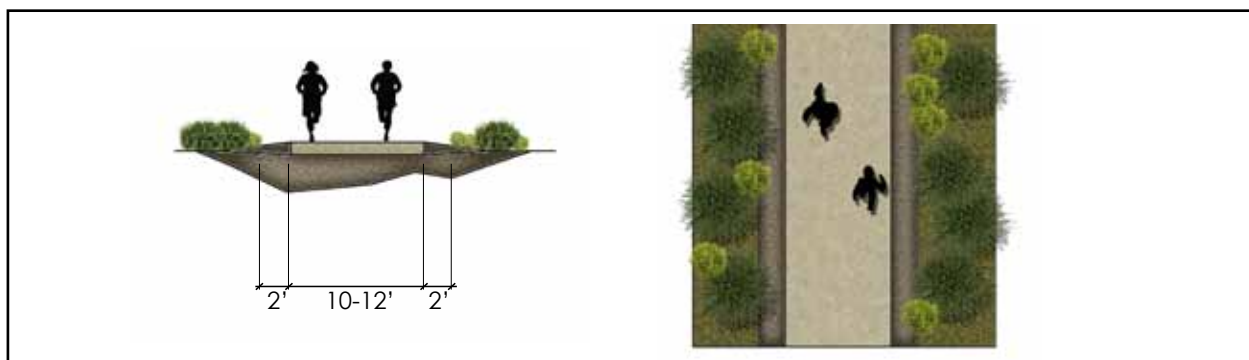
Typical cross section (left) and plan view (right) of an urban soft surface trail.
